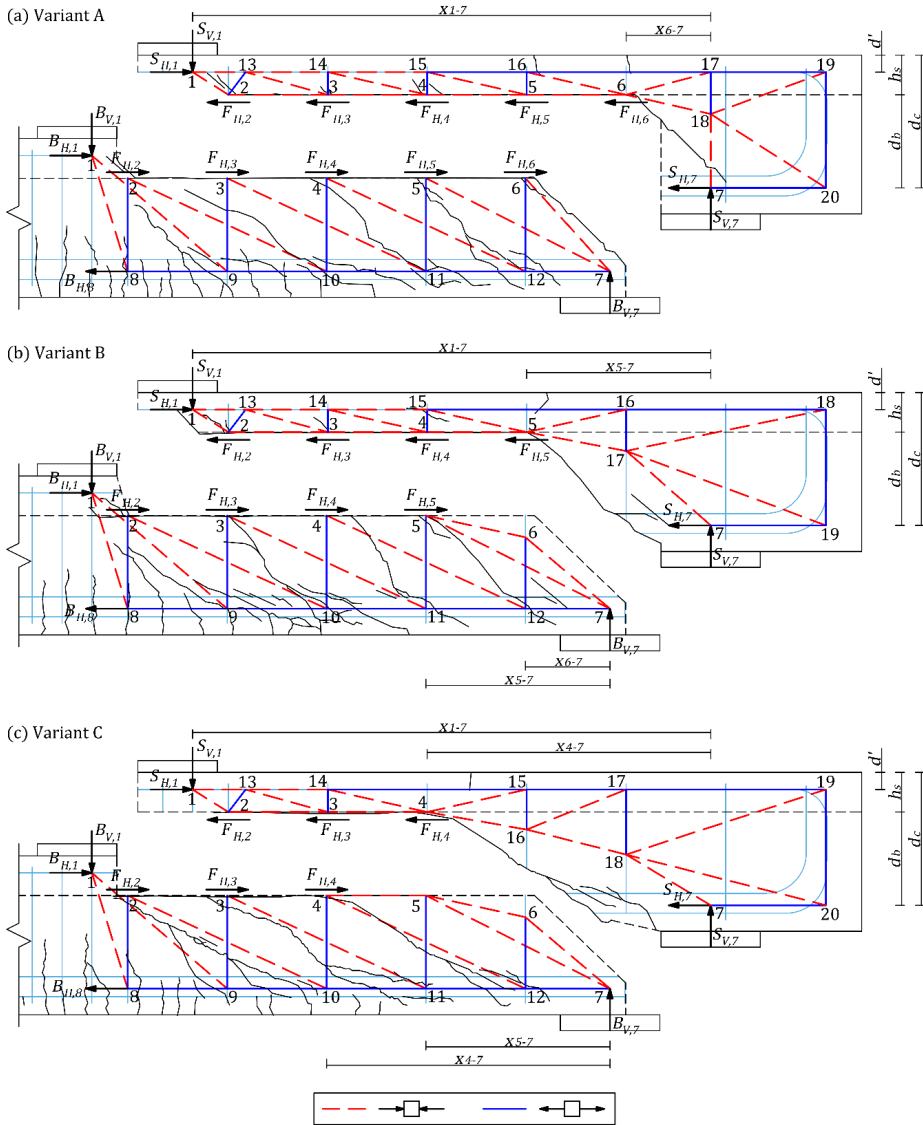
Proposed strut-and-tie models for the precast beam and the cast-in-place slab separately: (a) Variant A (specimen NWP3B2); (b) Variant B (specimen NWP2B2); (c) Variant C (specimen NWP1B2).
